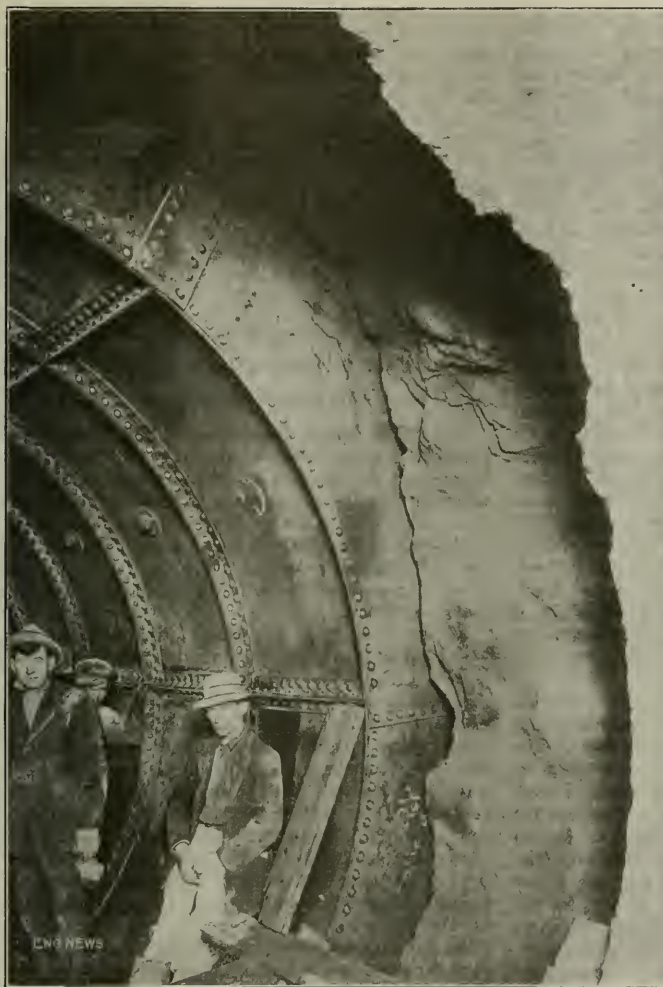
END OF STEEL INTERLINING, SHOWING STEEL DIAPHRAGM RIVETED INTO PLACE
